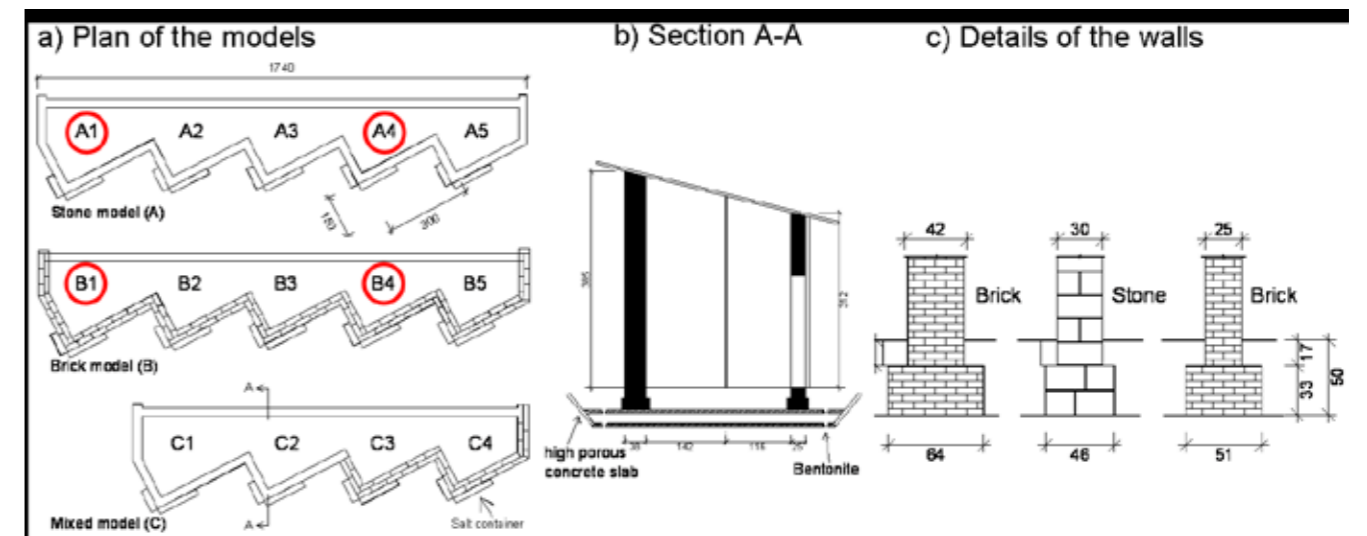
Full-scale models plan, section and details of walls and foundations. Source: Polimi.
